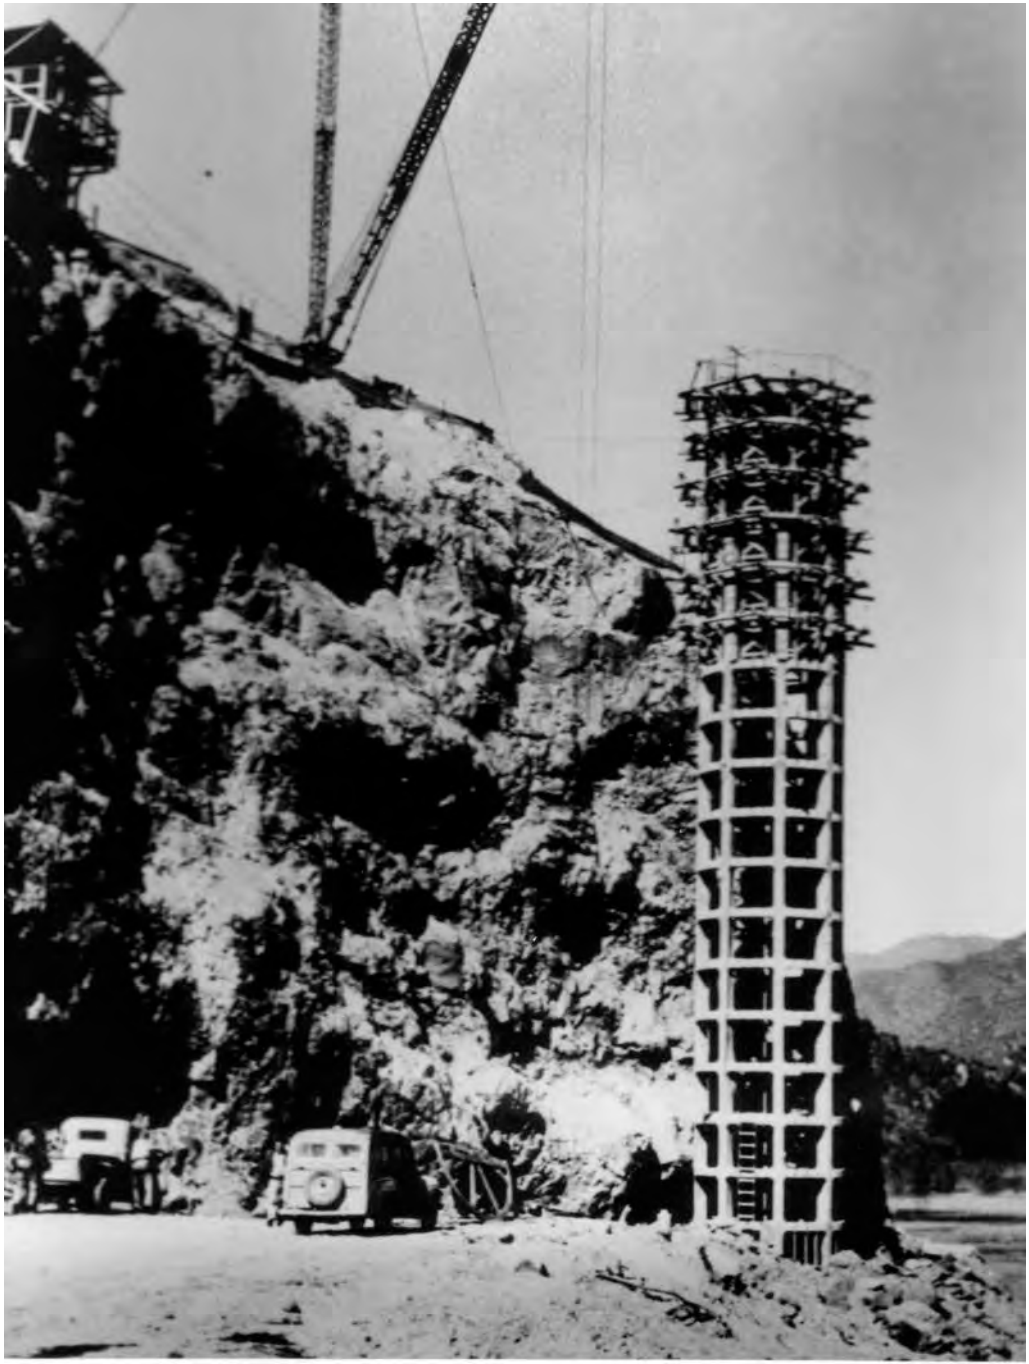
OUTLET CONTROL TOWER LOOKING NORTH IN RESERVOIR AREA.
